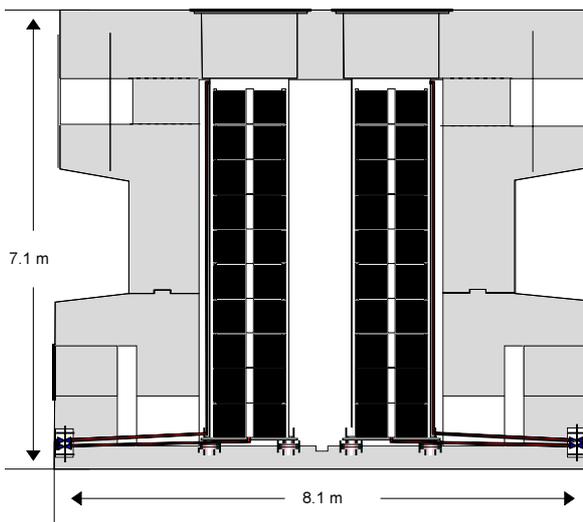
MACSTOR Dry Storage Module - Gentilly 2
